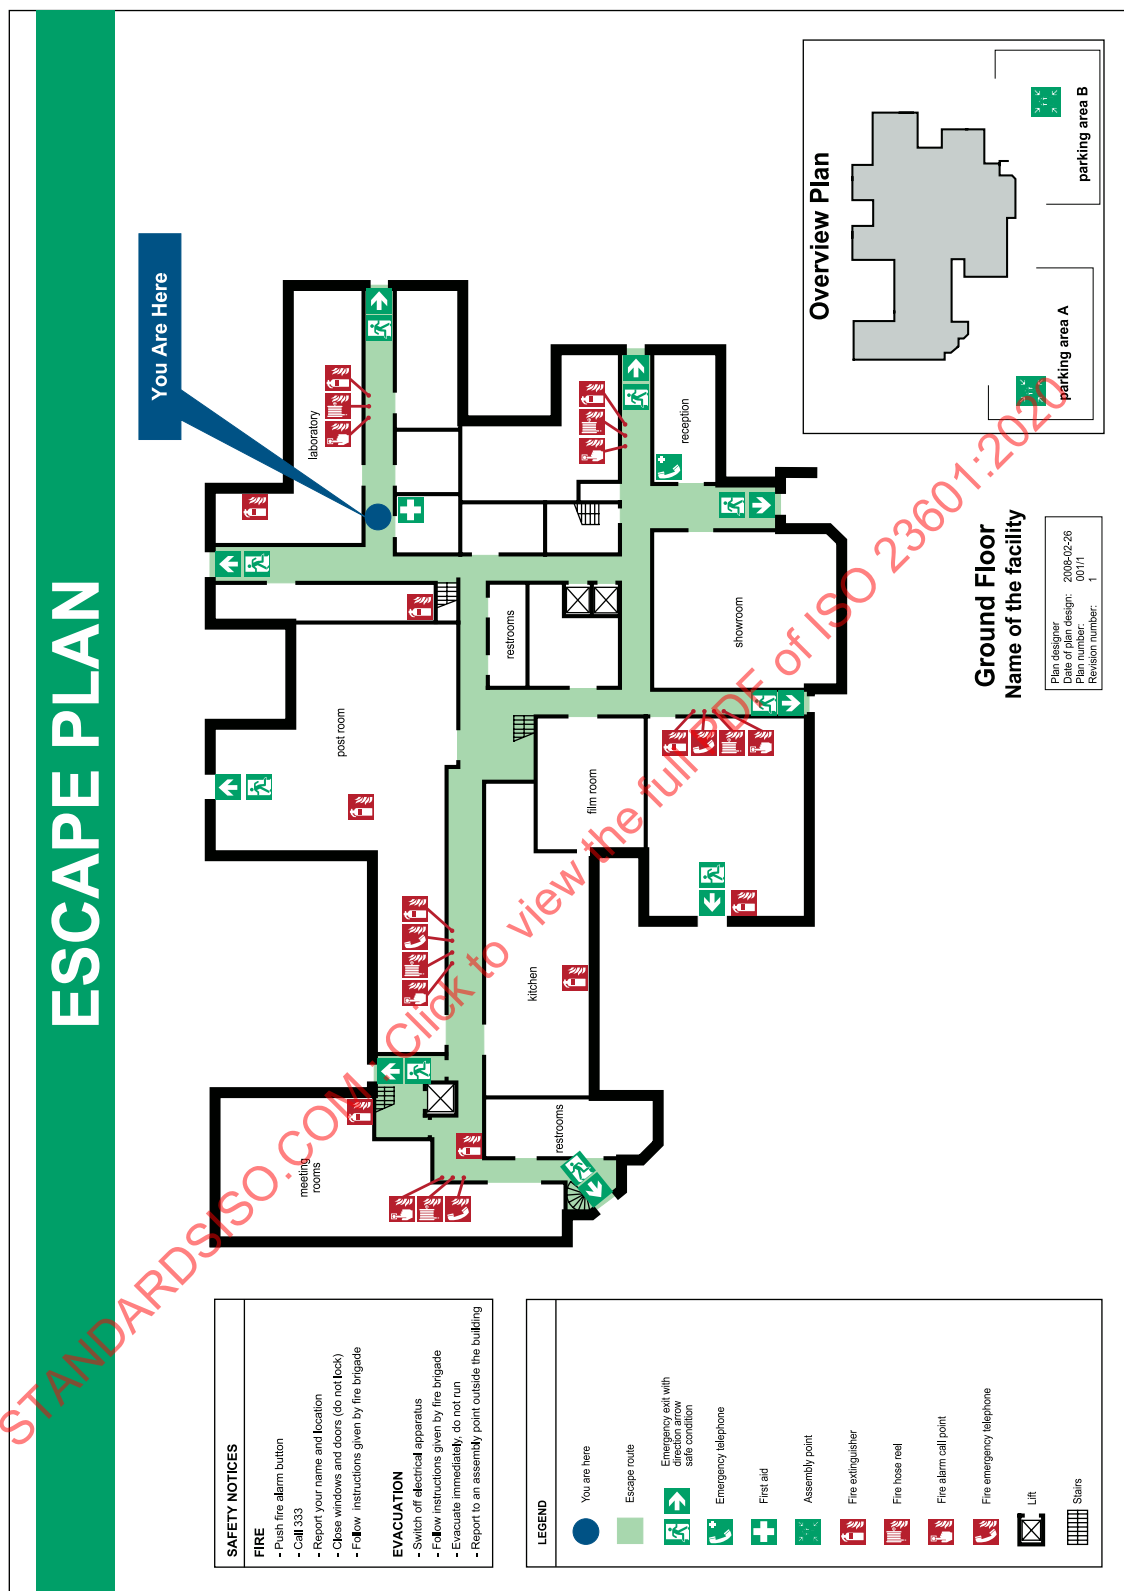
Example of an escape plan without directional arrows — Complete floor
